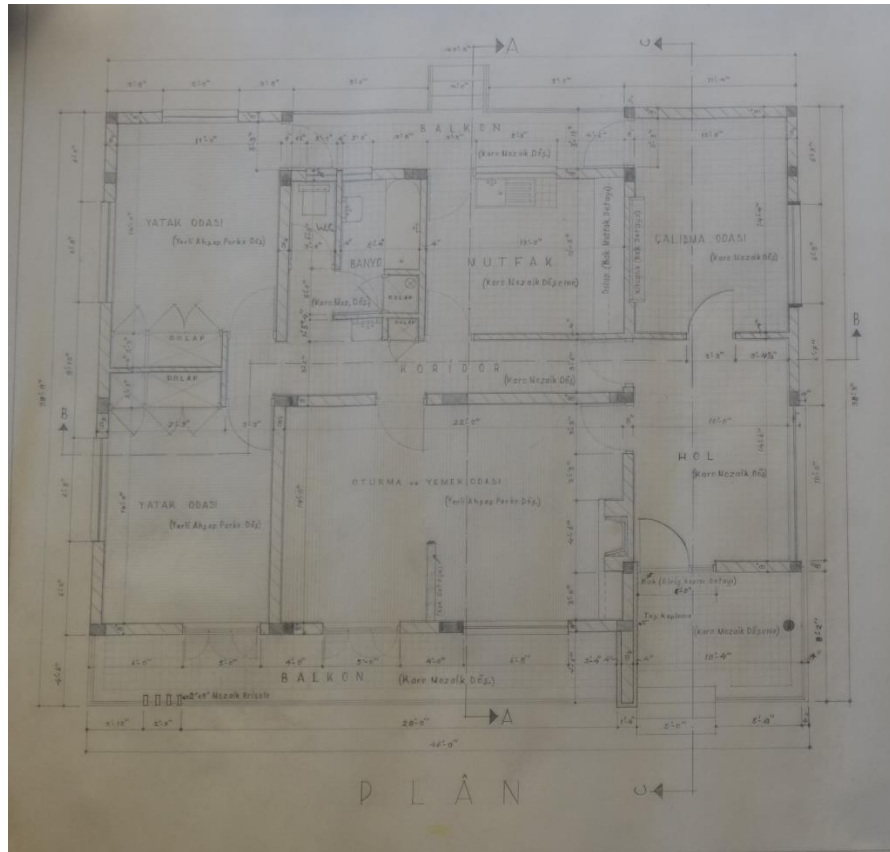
The original plan of Niyazi Ali House with single floor in 1961 (from Abdullah Onar archive with the permission of Anber Onar)
